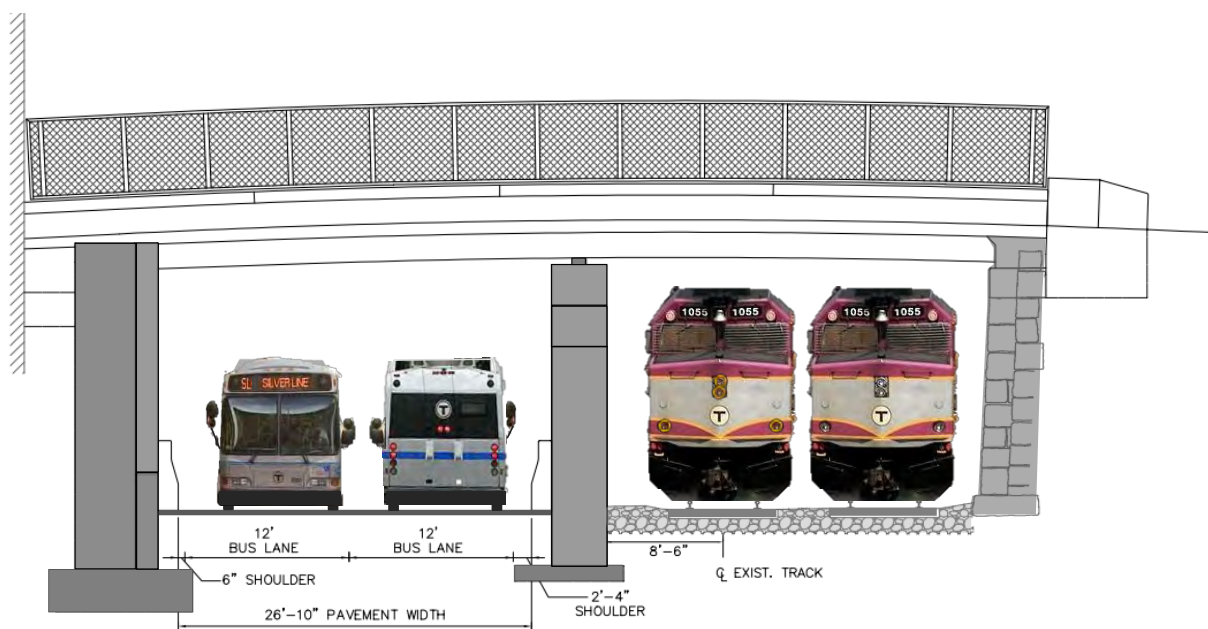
Cross-Section of New Concept of Washington Avenue Bridge with two-pier Design
